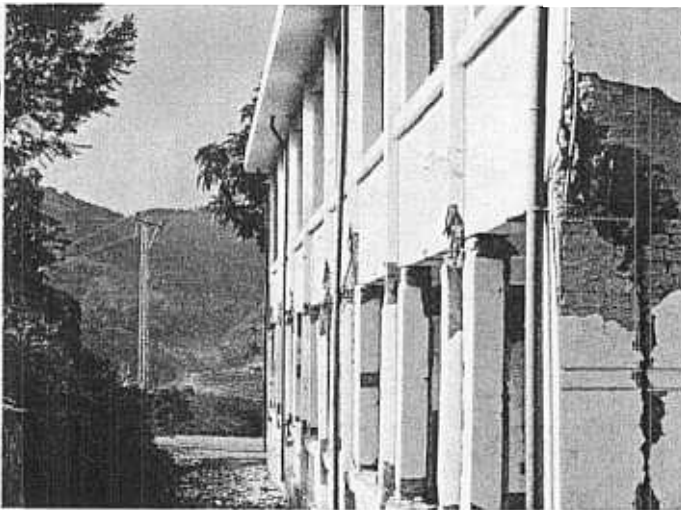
Yansoi Village primary school, intensity 9. Two-storied reinforced concrete frame structure.
